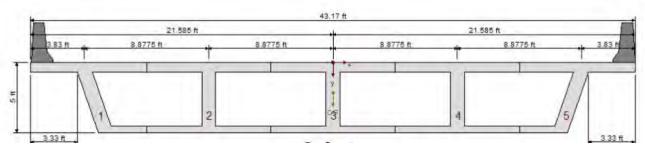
Bridges on SR303 over existing canals, 2C-22 and 2C23- Typical Section
